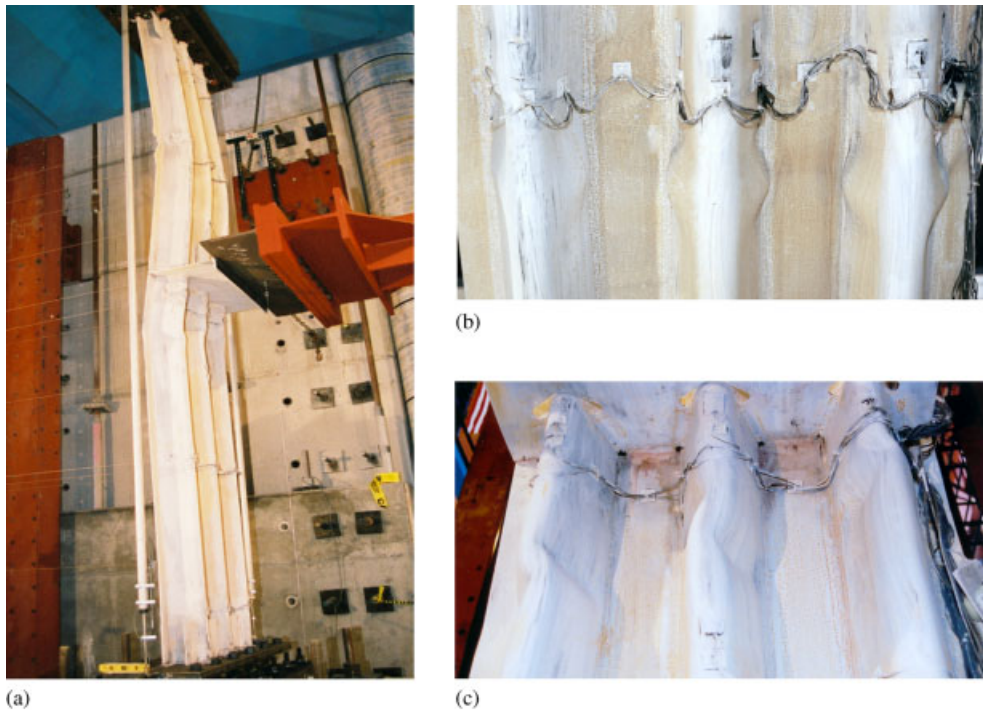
Deformed configurations after testing (Deck Specimen 1): (a) overall view; (b) upper panel; and (c) lower panel.
